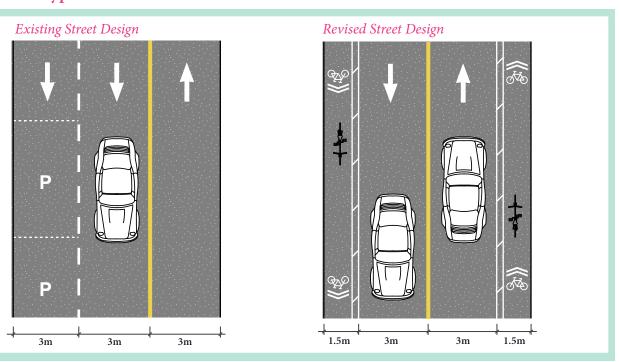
Street Design Revitalization; Street Type 4, plan
